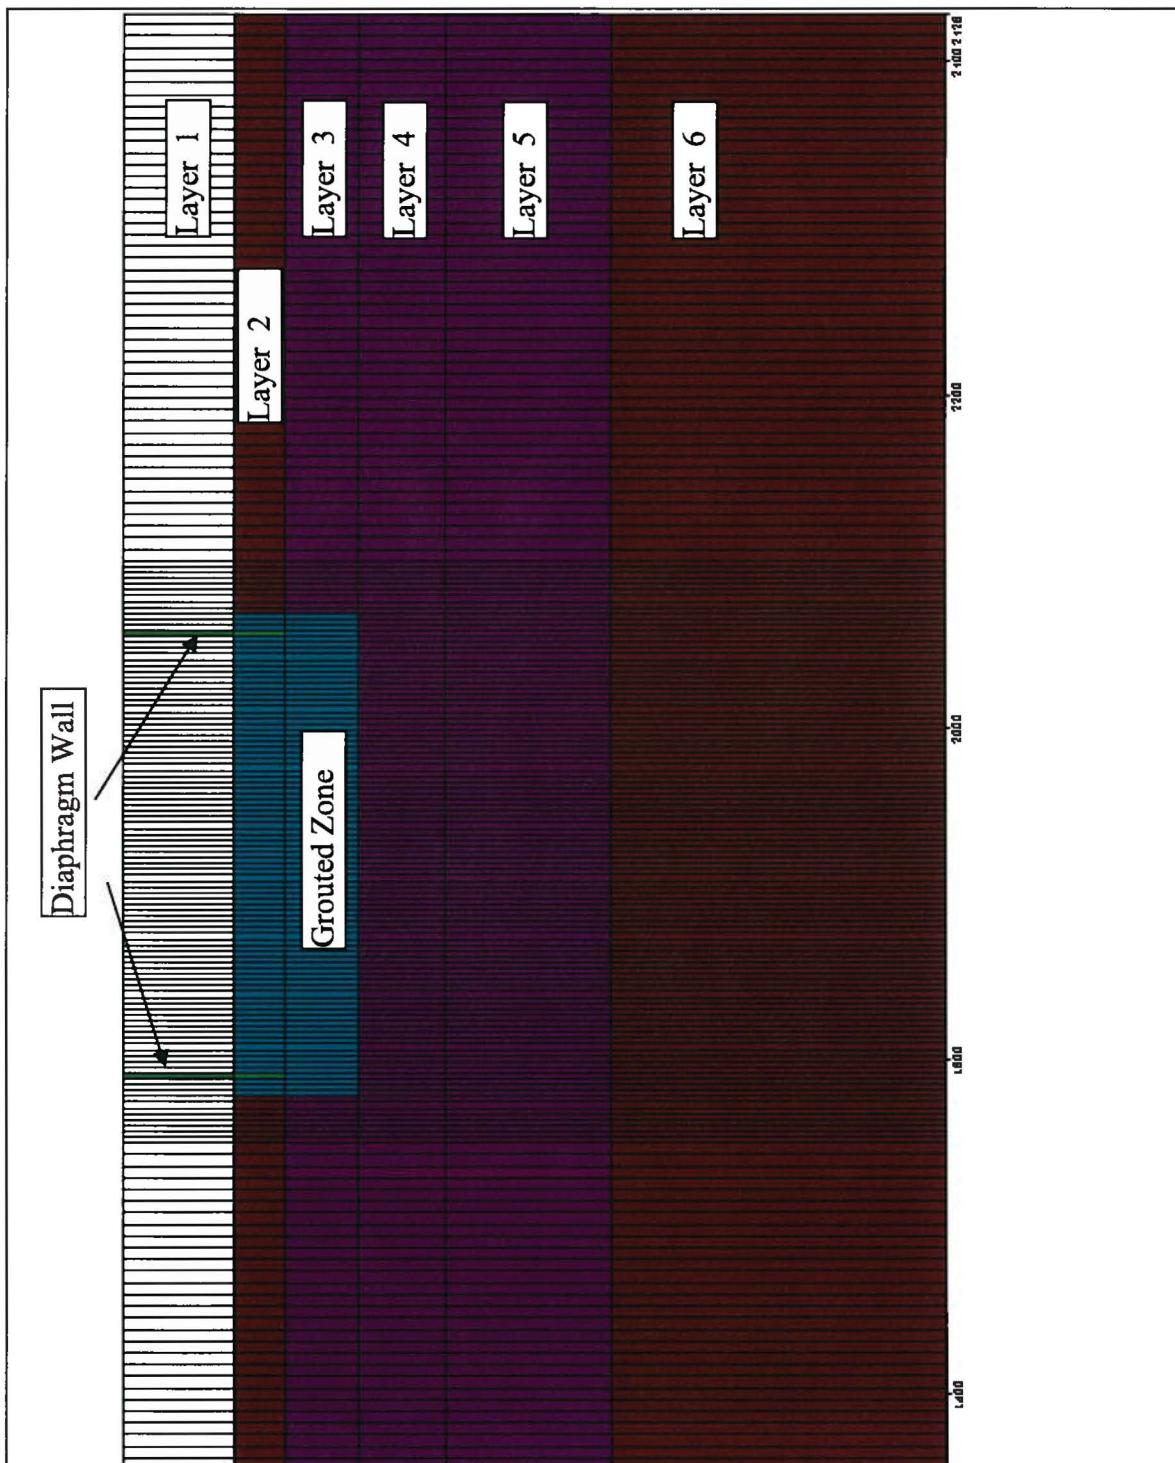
SCHEMATIC CROSS SECTION OF MODEL LAYERS, DIAPHRAGM WALL, AND GROUTED LIMESTONE SLAB
